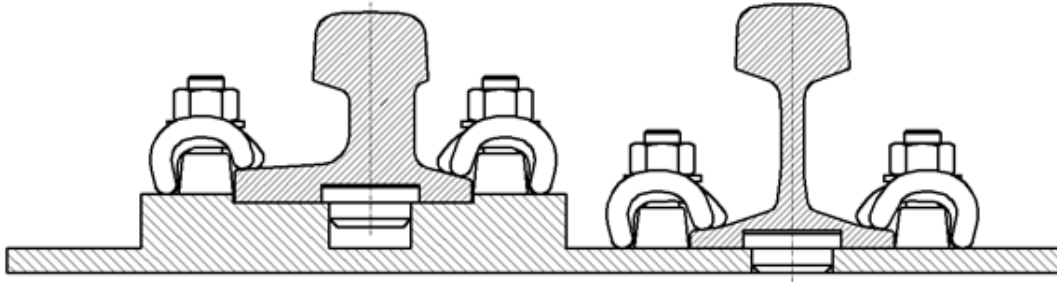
A cross section of the switch heel sole plate with retaining pins
